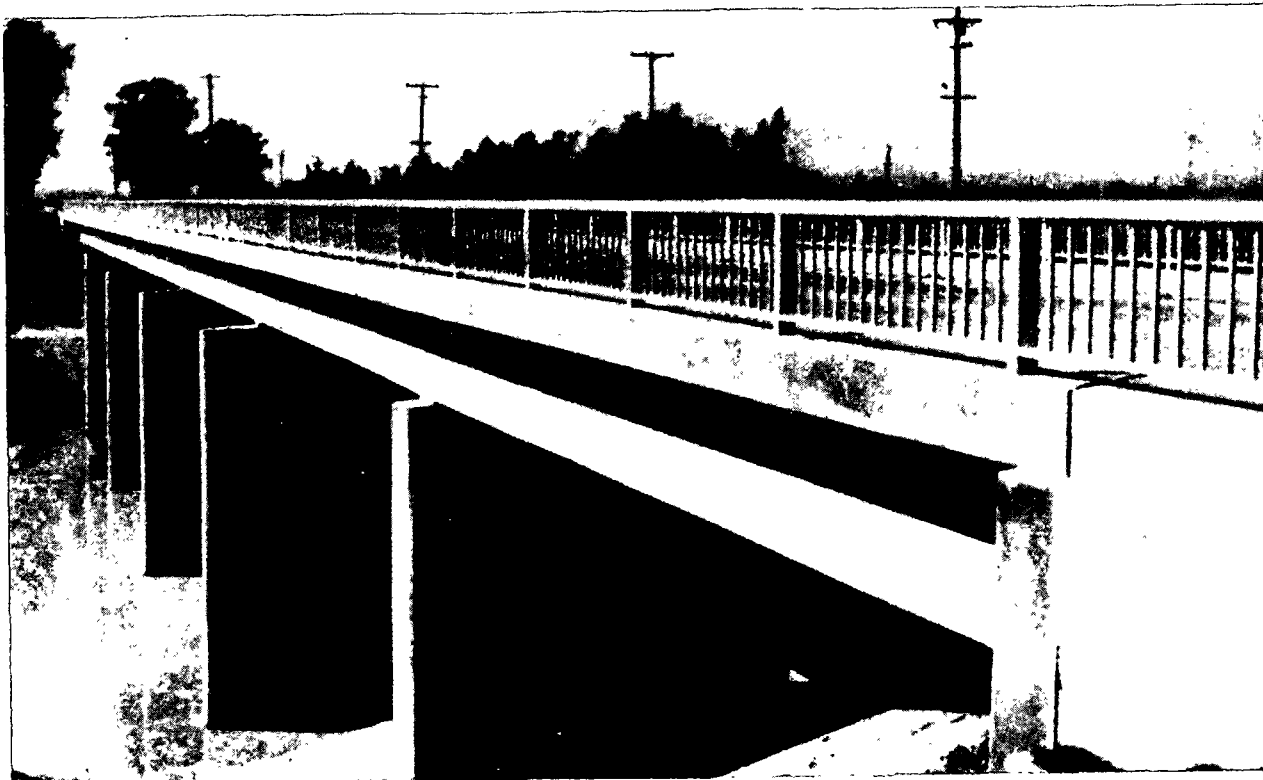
Simple stringer bridge with steel I-beam stringers and concrete slab flooring.
